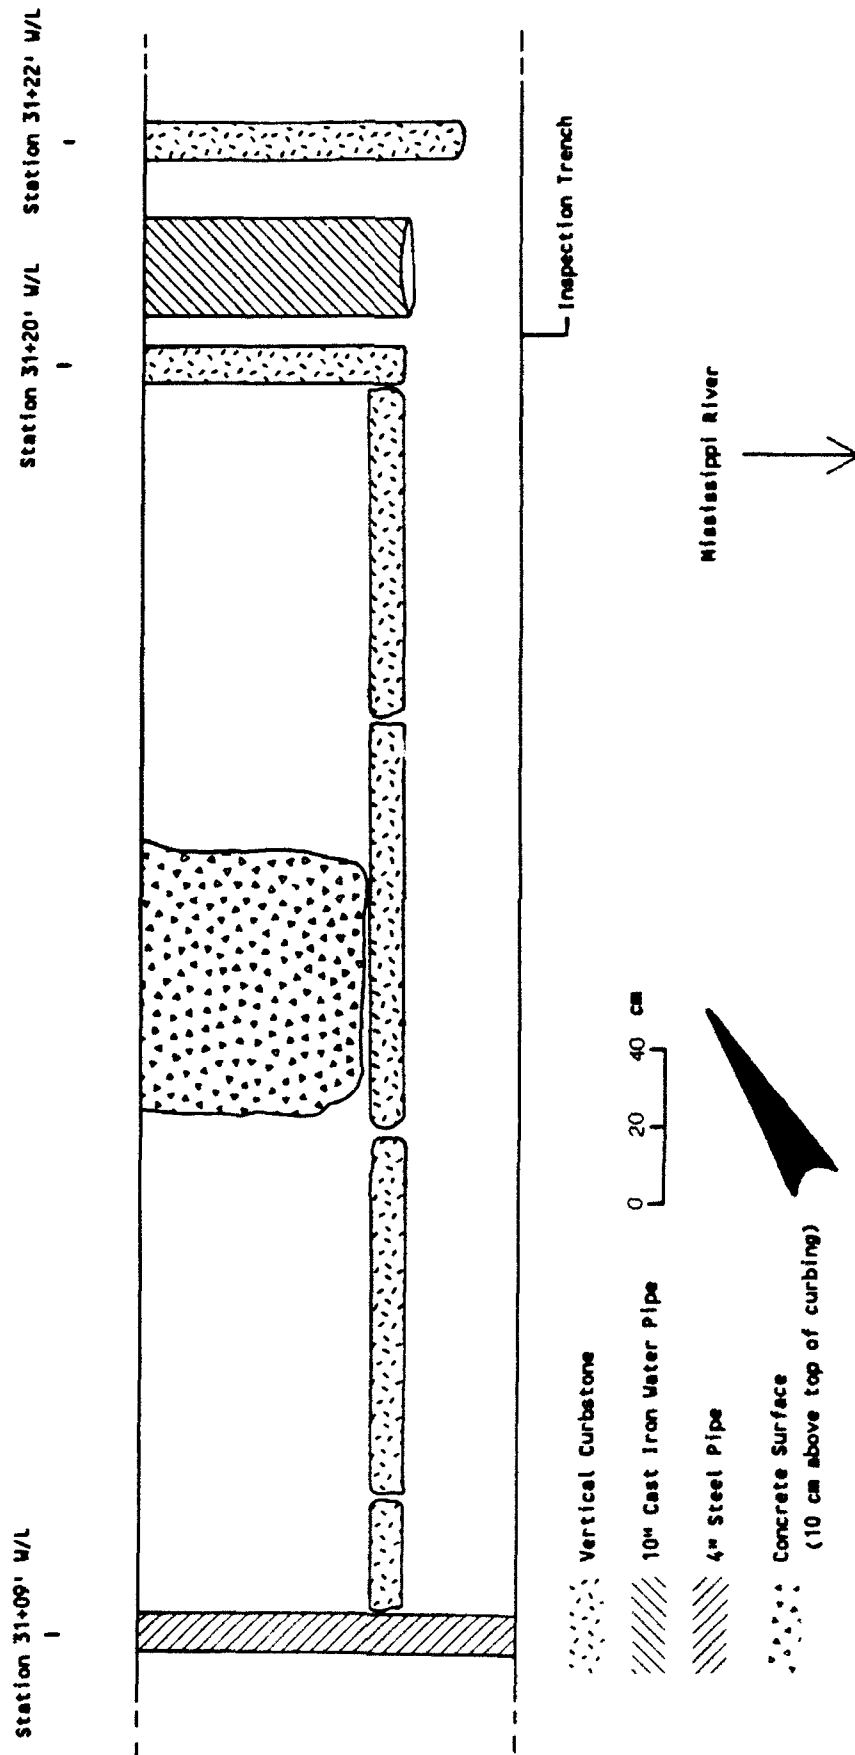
Plan of curbing between Station 31+09' W/L and 31+22' W/L.
